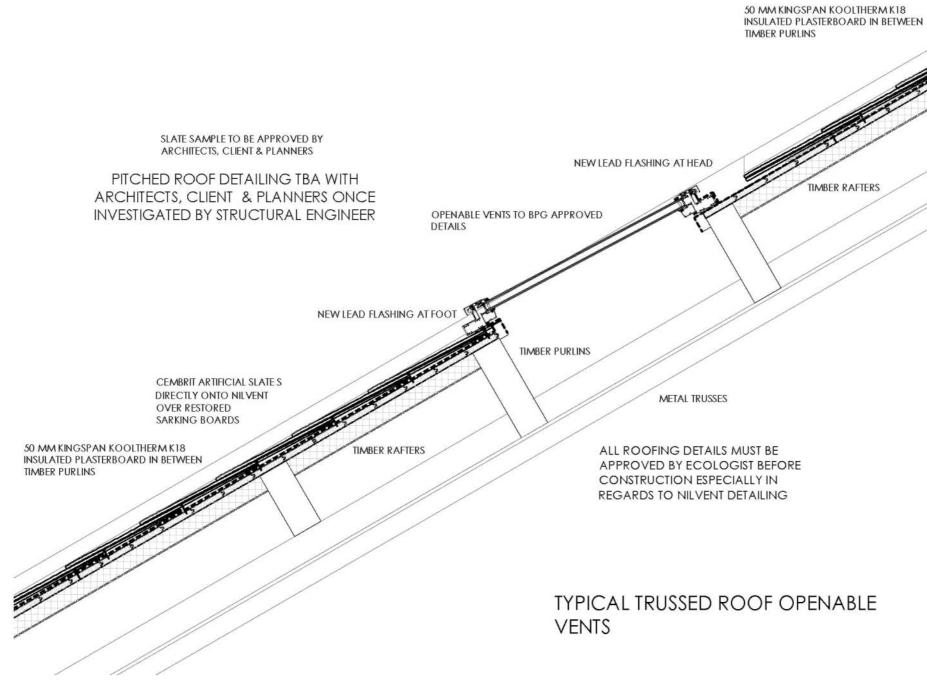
Proposed replacement patent glazing to roofs; new openable vents
